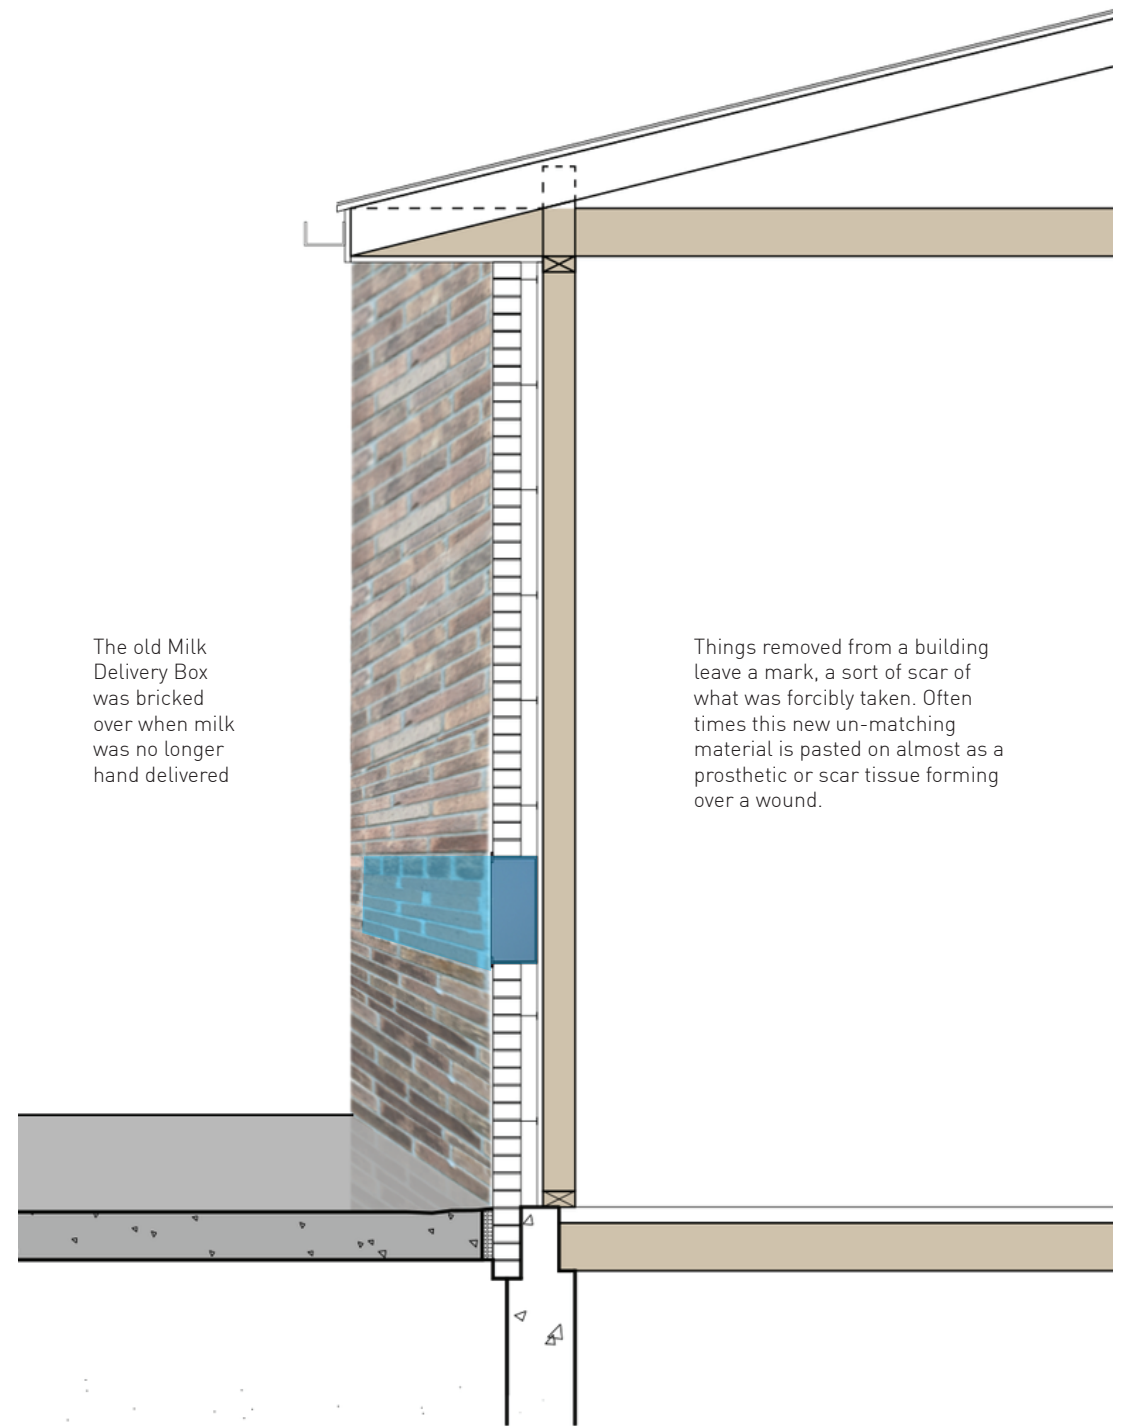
Section cut through exterior wall of home showing milk box construction
